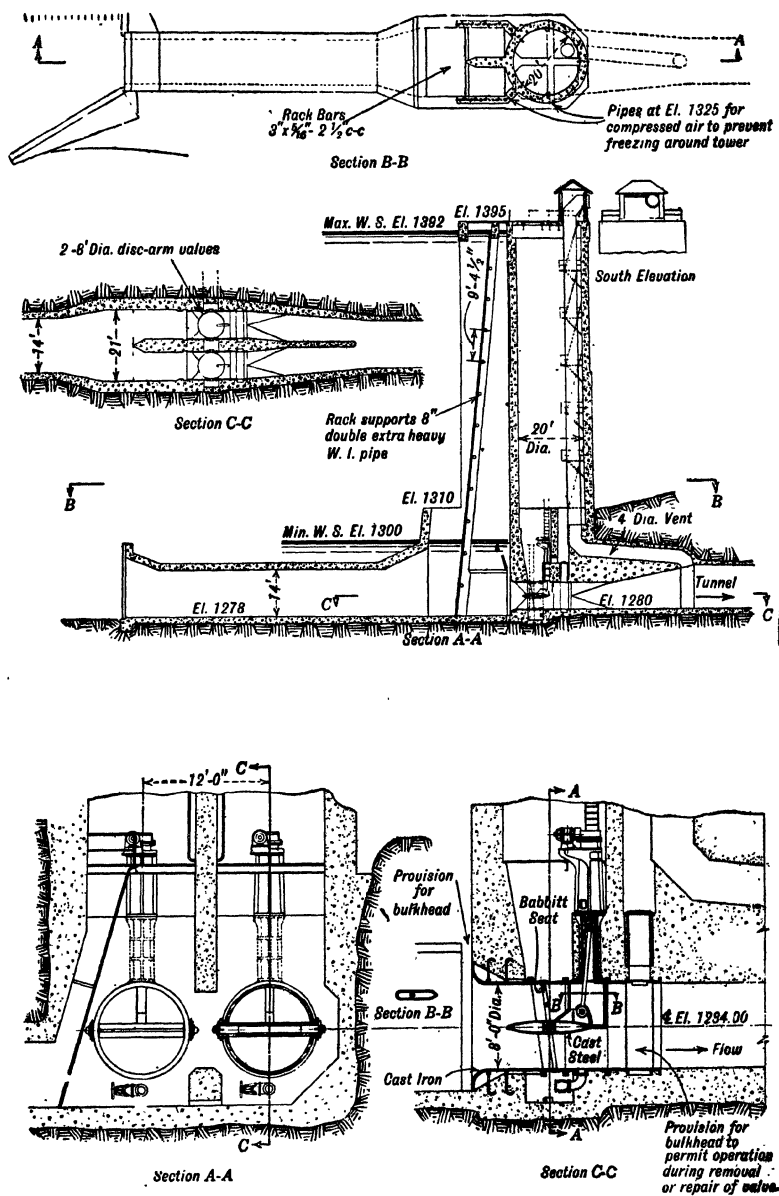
Tunnel Intake, Davis Bridge Development, New England Power Co.
